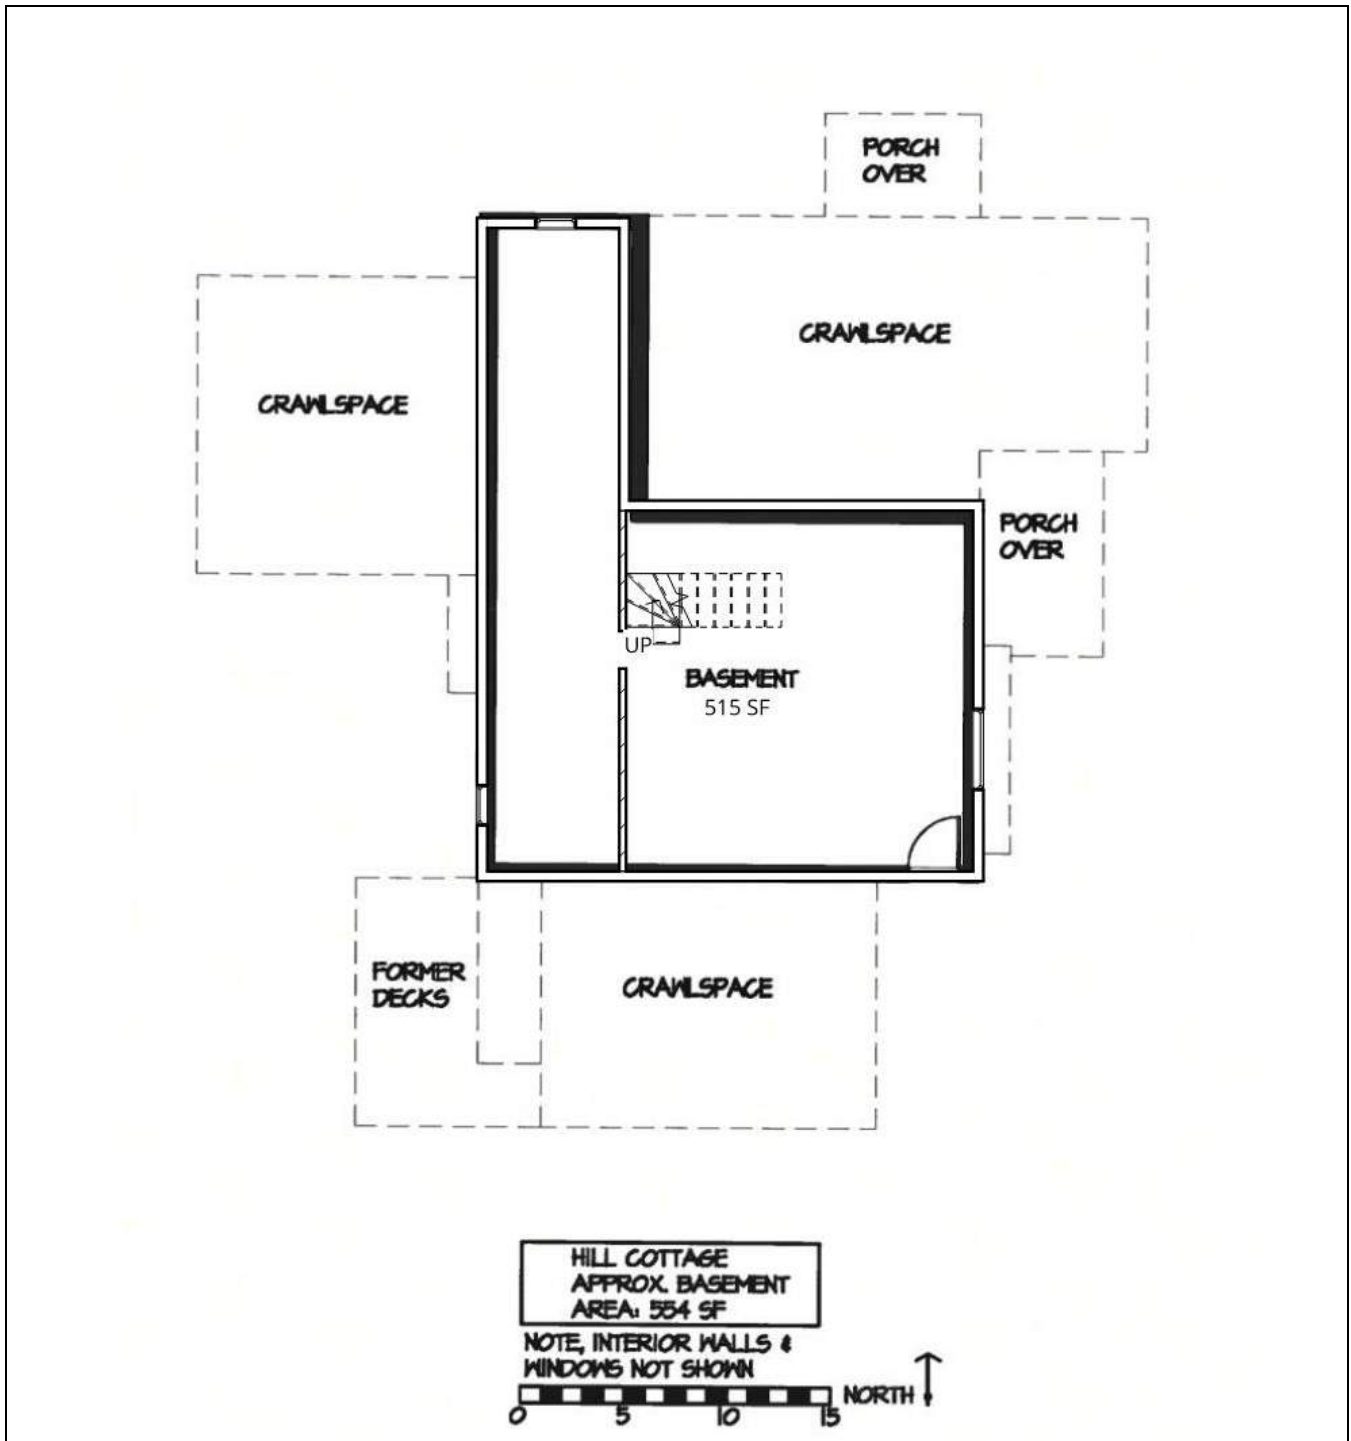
Basement level, Hill Cottage. Accessed from the main floor via a set of stairs, as well as an exterior door. Interior layout overlaid on record drawing.
